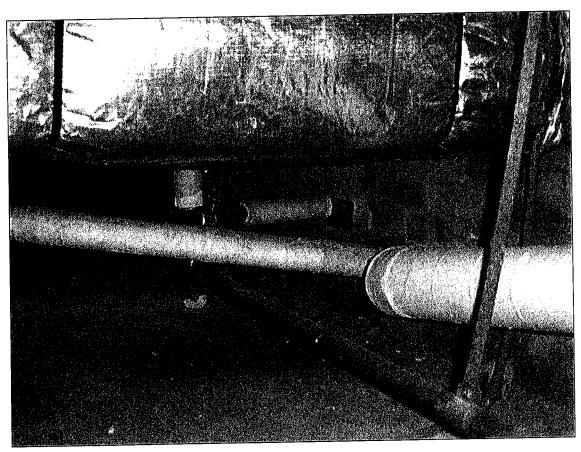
Insulated Pipe Elbow on Ceiling Space Above Old Theatres (Asbestos Free)
